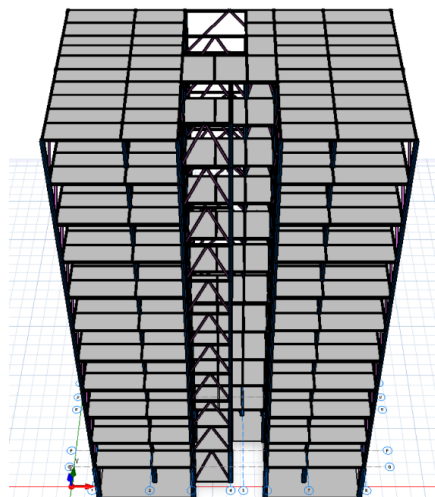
SS10 Model (Steel Model - 10 Floors with 1 Basement)
